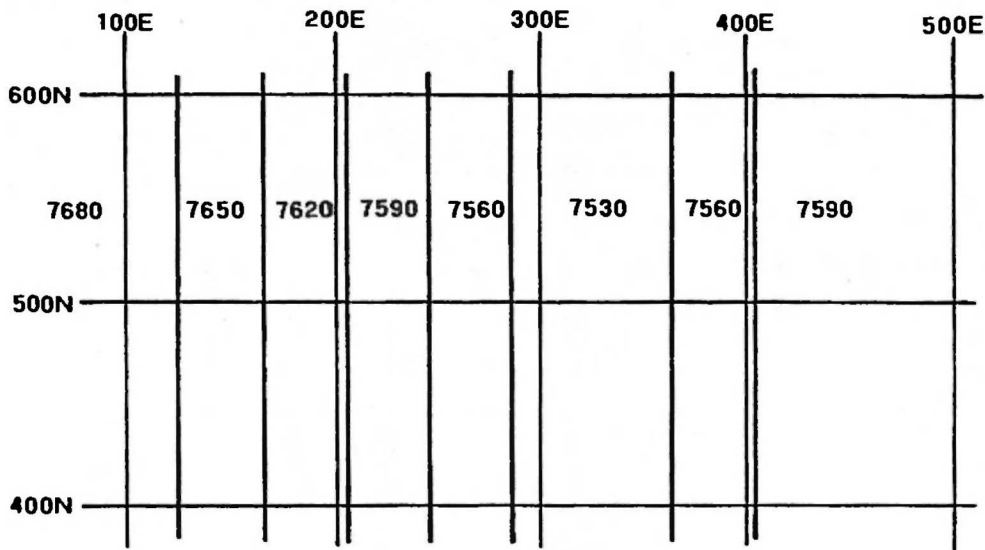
Resulting plan view corresponding to the midbench representation of Figure 4.84. The given elevations are bench toe elevations.
